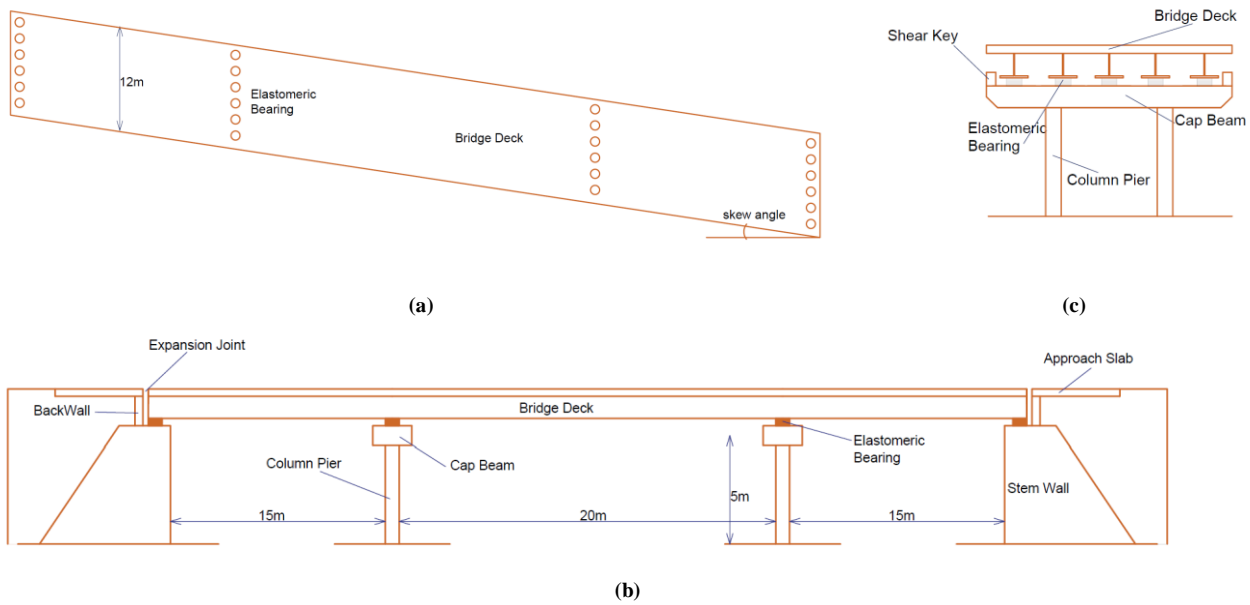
The model bridge, a) plan, b) longitudinal view, c) transverse section.
